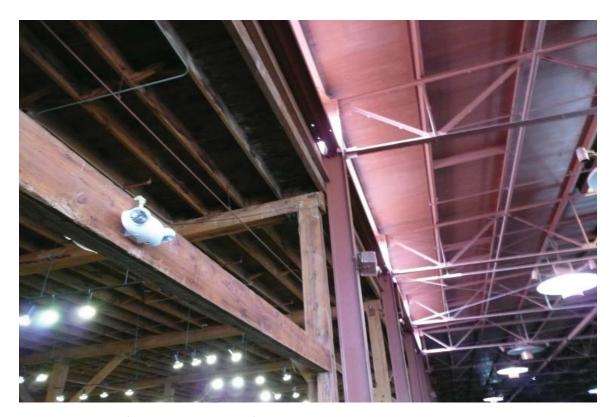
Detail of structural members of the southern shed and 1980s addition (ARG September 2009).
